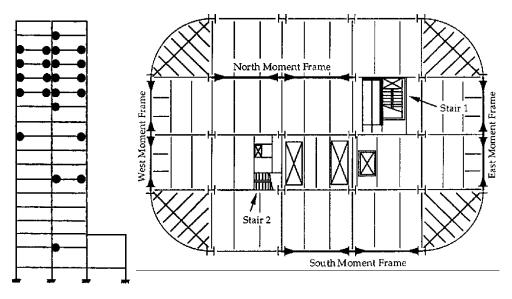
Structural system for 17-story building damaged in Northridge (Chi et al. 1997). Note the large percentage of exterior (one-sided) connections.
